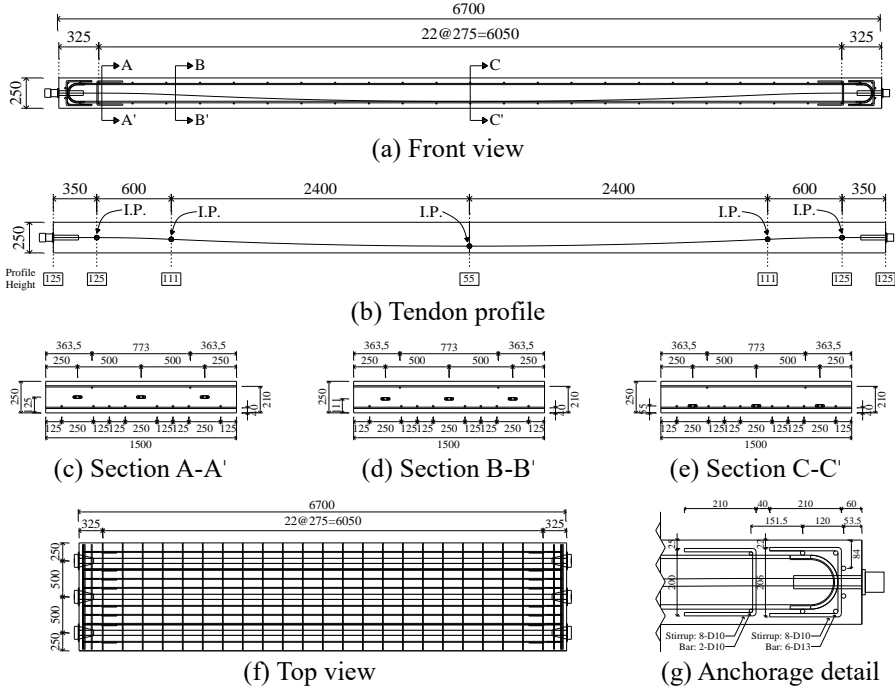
Details of Specimen PF-U2 (unit: mm)
